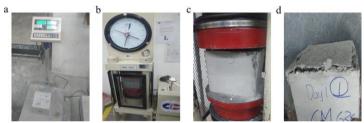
(a) Weighing of hardened concrete; (b) Compressive strength machine with load cell; (c) Specimen load test; (d) Specimen failure point of load test
